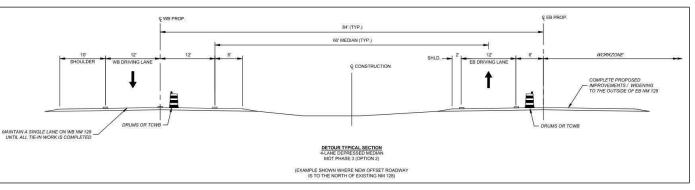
B. NM 128 MOT Typical Section – Four Lane Construction
